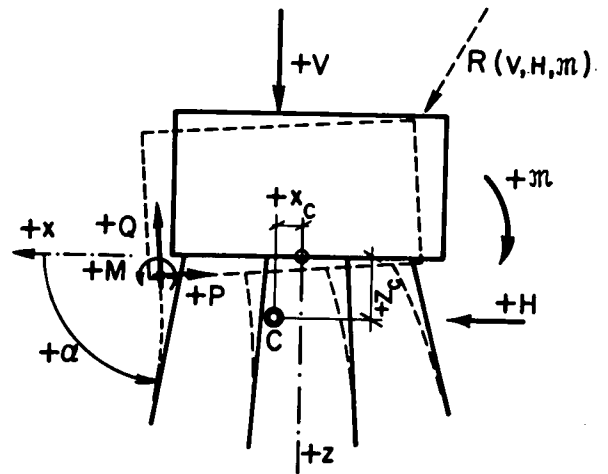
Problem of a pile foundation subjected to eccentric and inclined loads.
